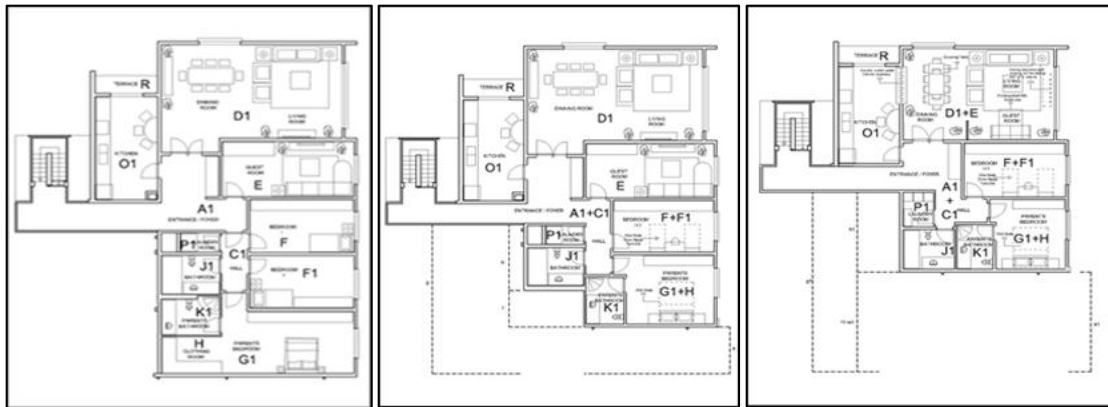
Existing upper floor plan/ Primary upper floor plan change/ Secondary upper floor plan change
